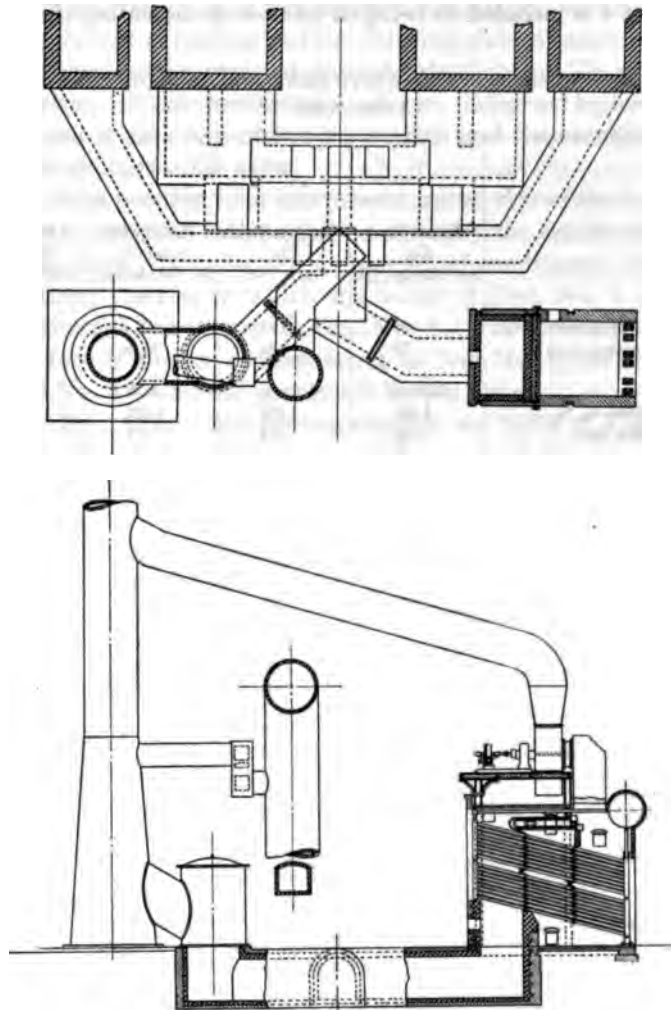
WASTE-HEAT BOILER FOR OPEN-HEARTH FURNACE
